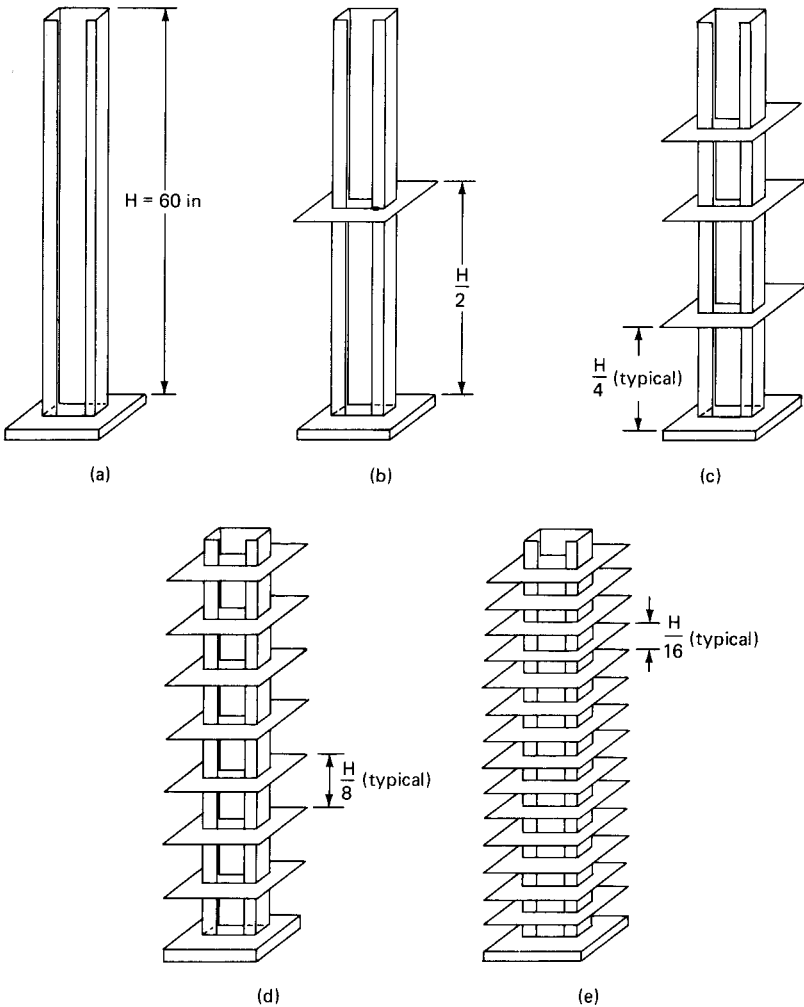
Various stages of model for torsion experiments. (a) Stage 1, no floor slab; (b) stage 2, one floor slab at midheight; (c) stage 3, three floor slabs; (d) stage 4, seven floor slabs; (e) stage 5, fourteen floor slabs.
